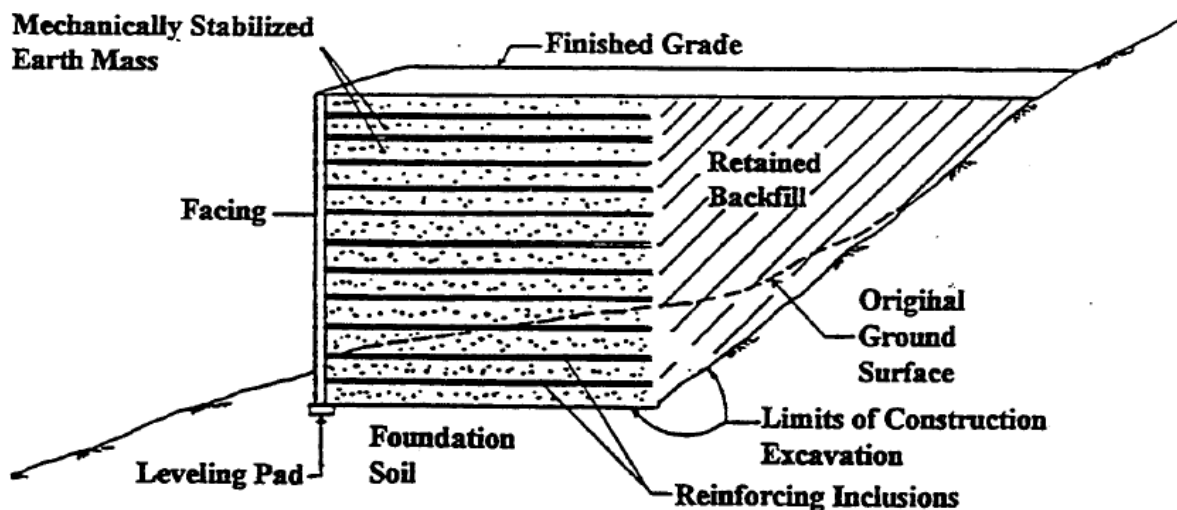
PRINCIPAL COMPONENTS OF A MECHANICALLY STABILIZED EARTH WALL
